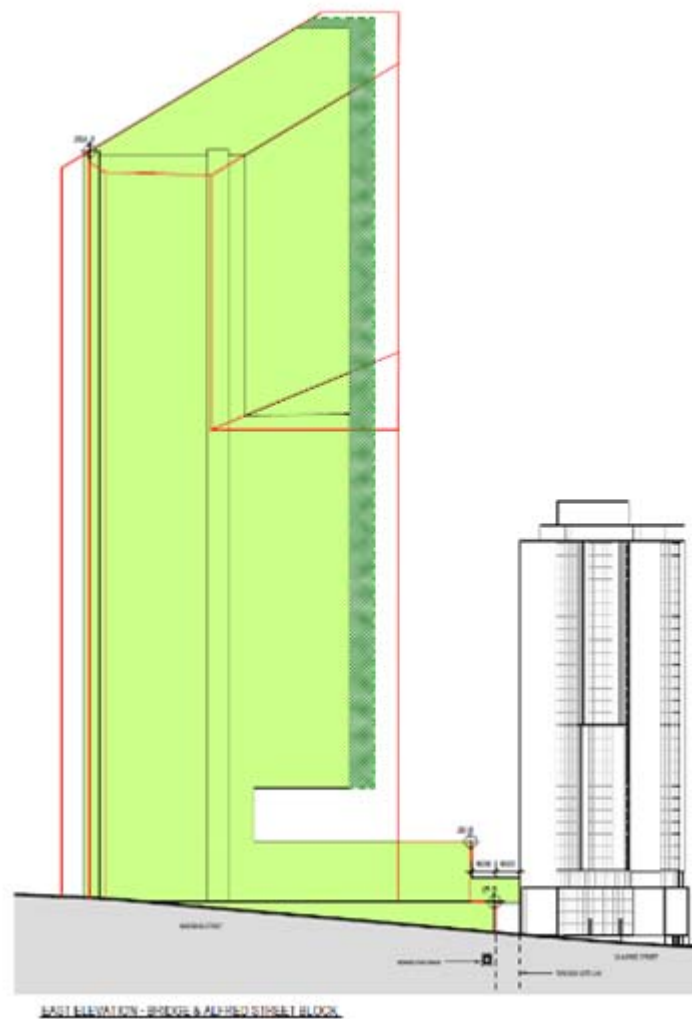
Stage 1 consent – building envelopes – Bridge and Alfred Street Block
